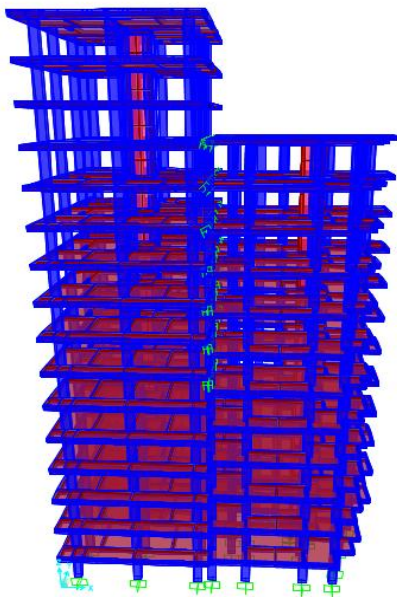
3D View of G+15 building with 3.2m floor to floor height & G+11 buildings with 3.5m floor to floor height with FVD
